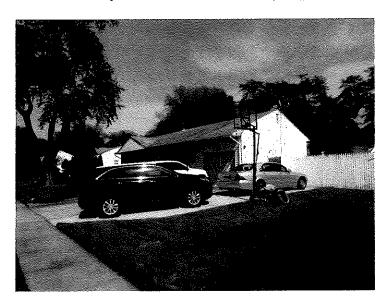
Looking towards front and right side of house. New concrete parking area in foreground.
